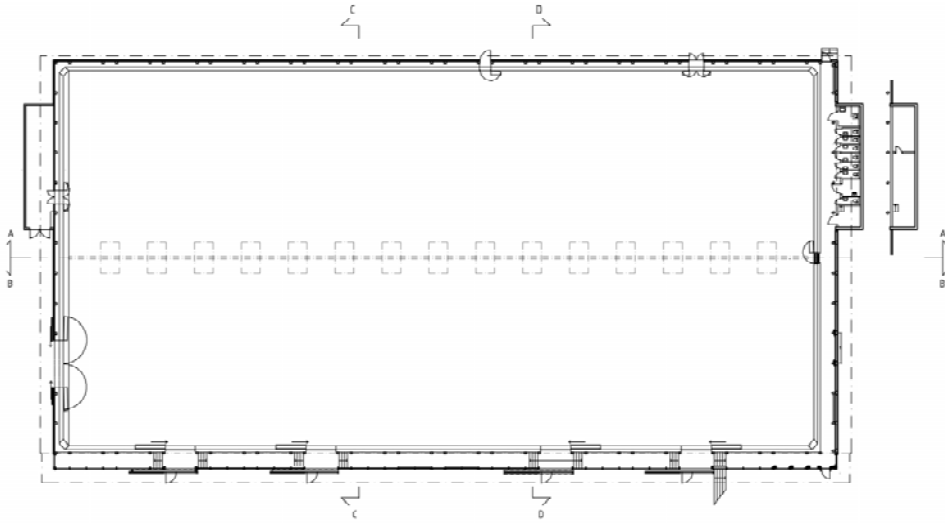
Plan layout of the equestrian hall in Flyinge.
